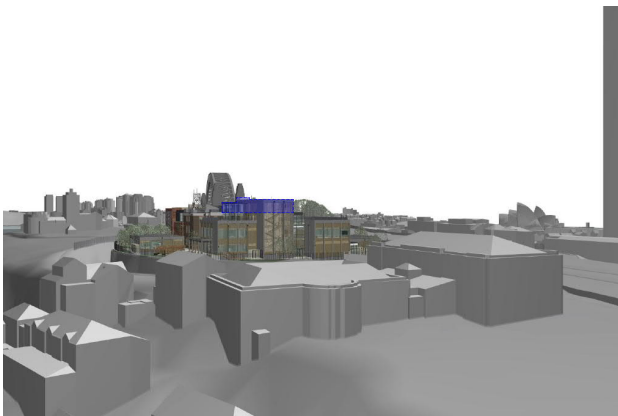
Observatory Tower – Viewpoint 21 low-level
